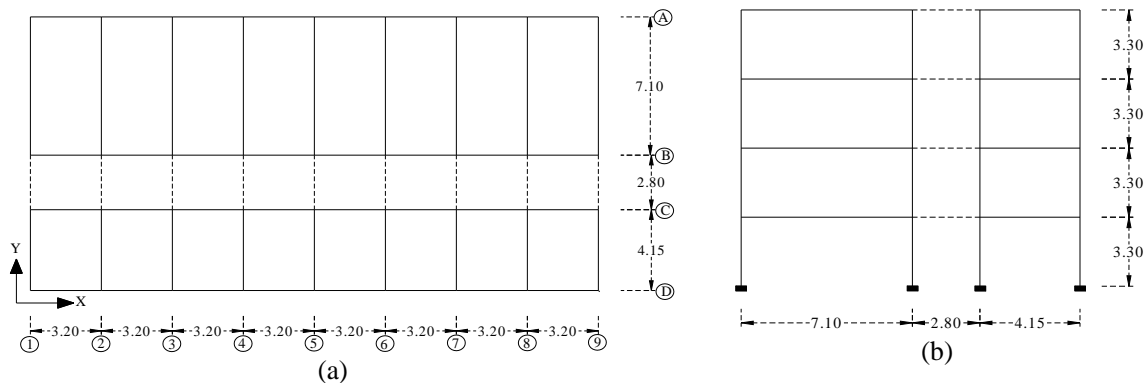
(a) Plan of the building (b) Side elevation of four storey building
